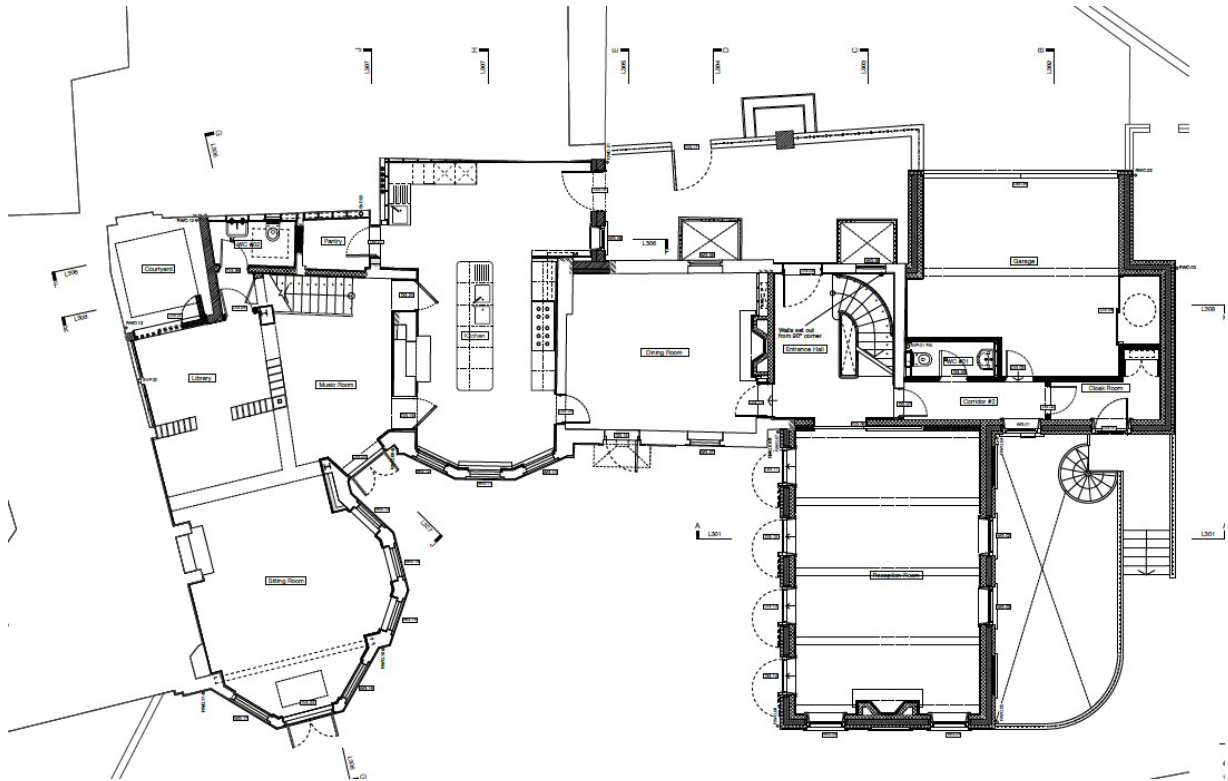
Proposed Ground Floor Layout at Grove Lodge
